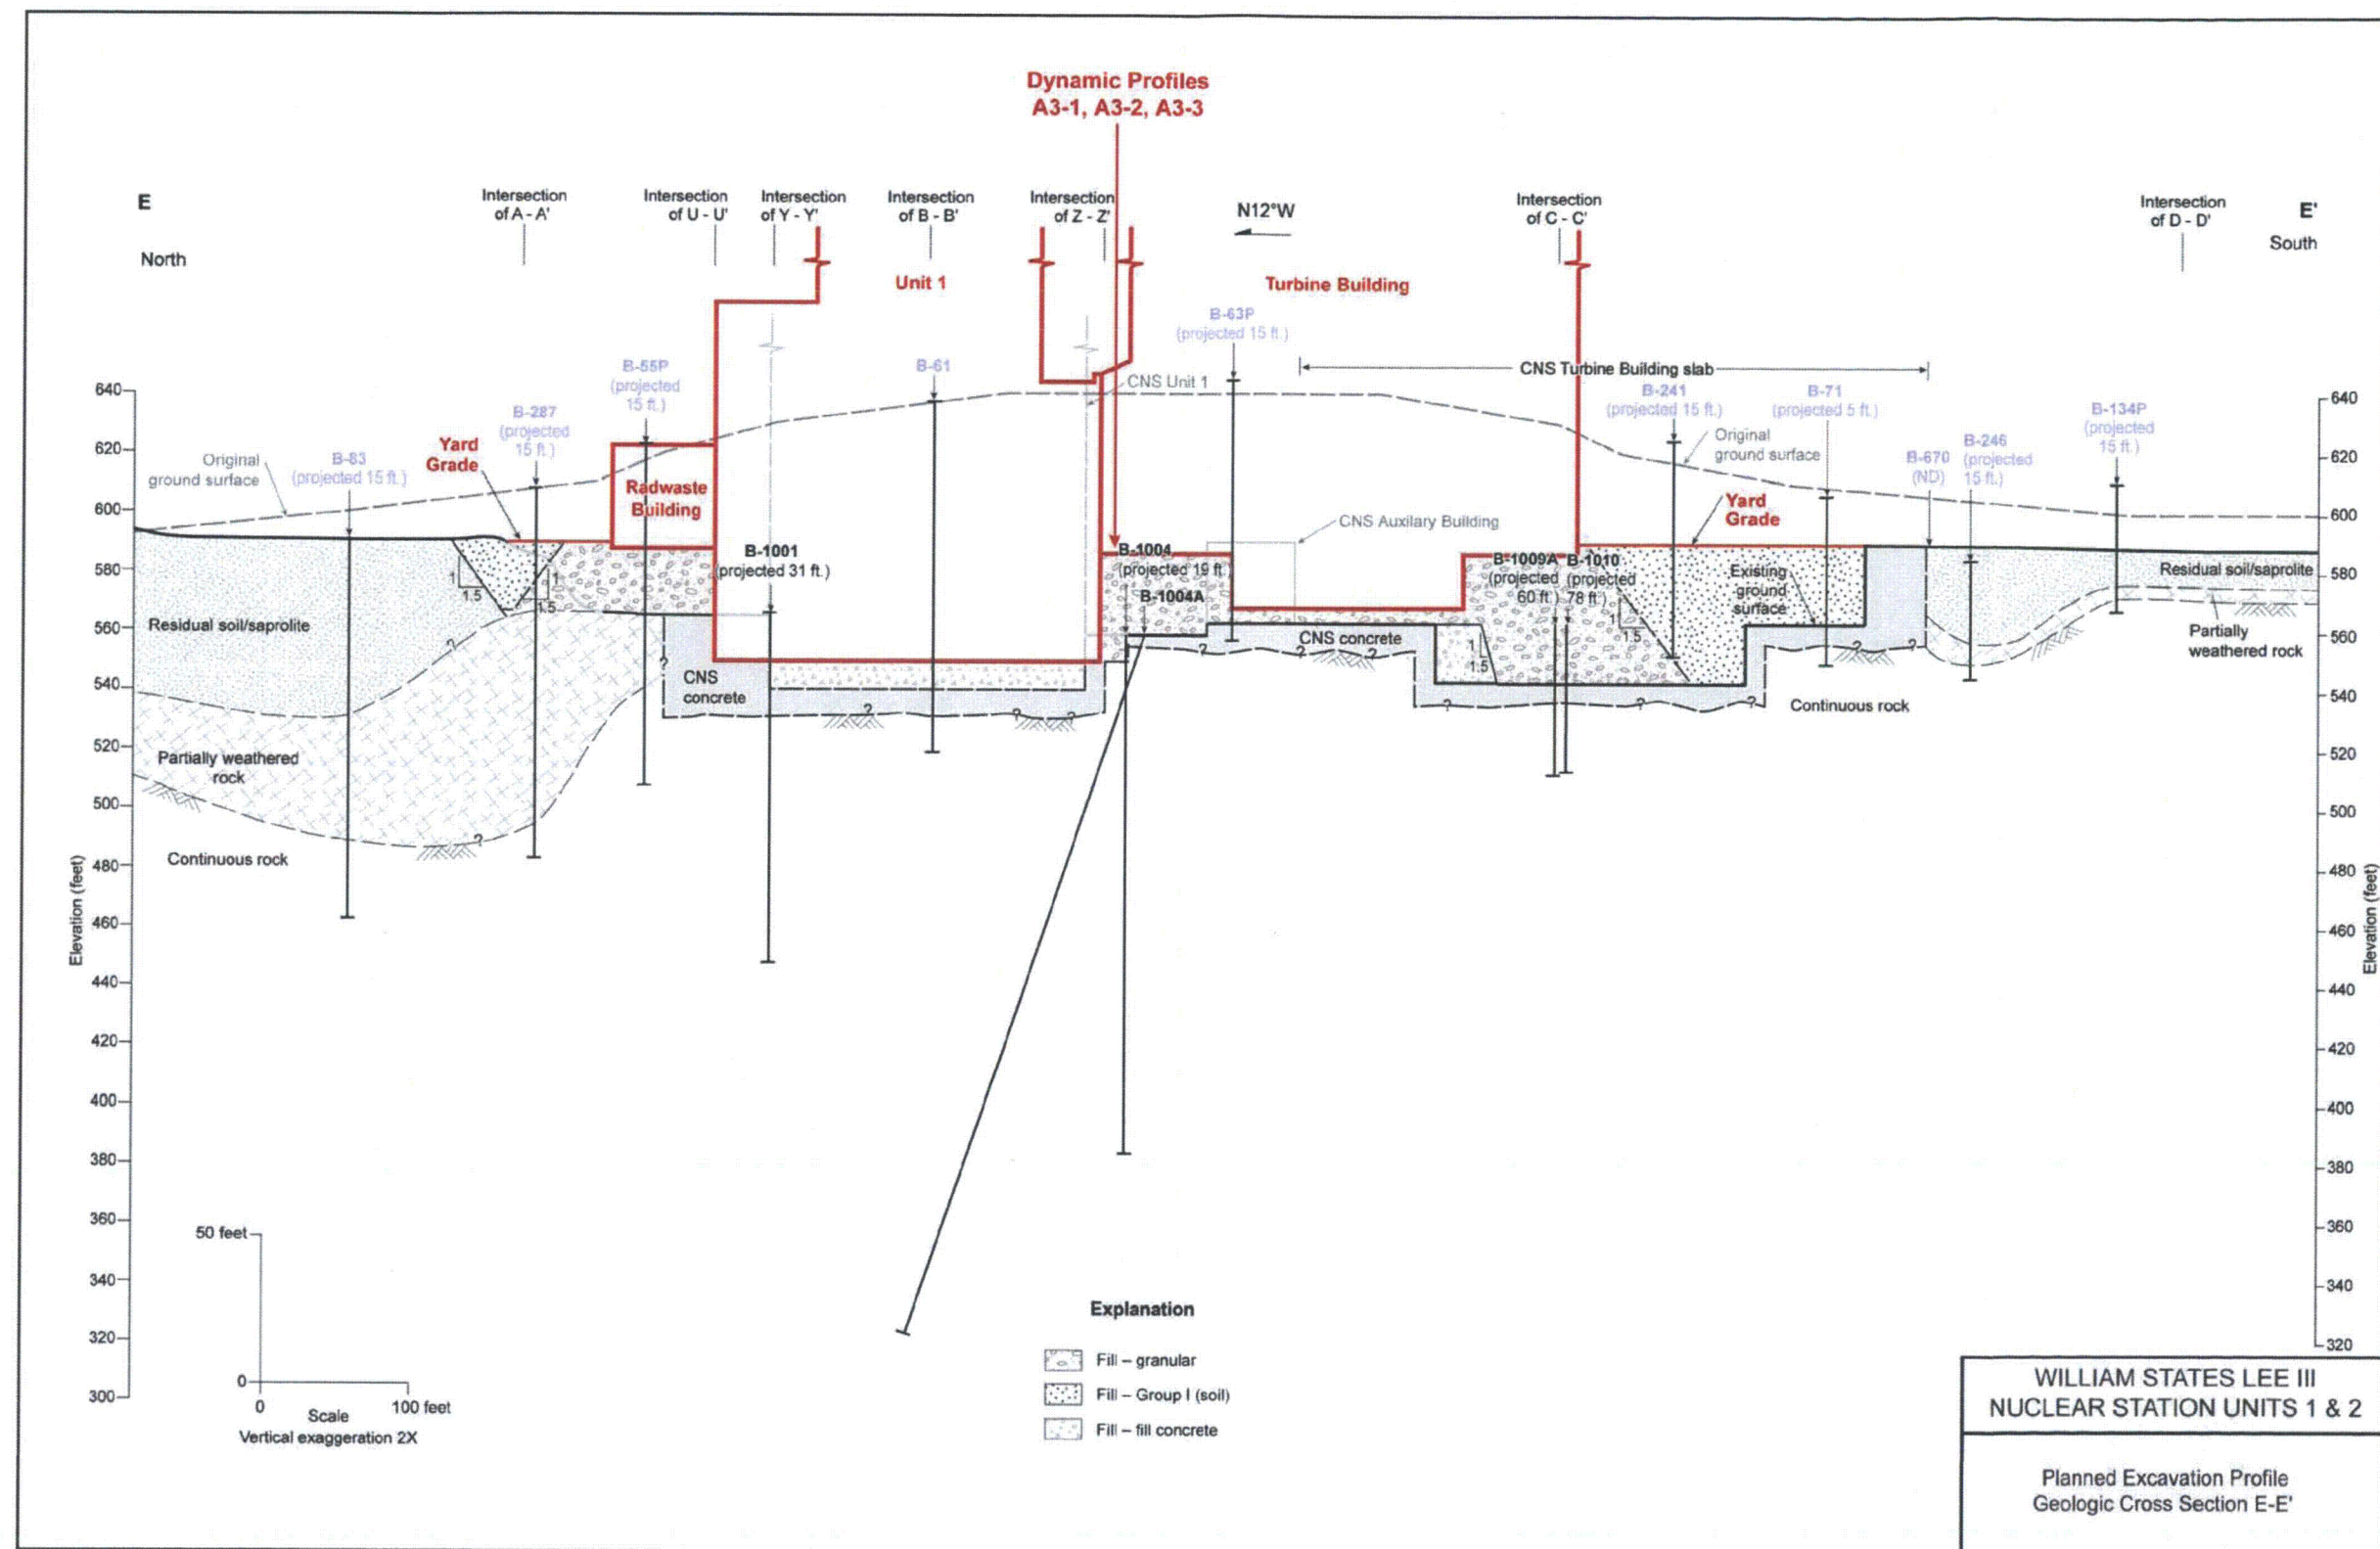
Planned Excavation Profile Geologic Cross Section E-E'
